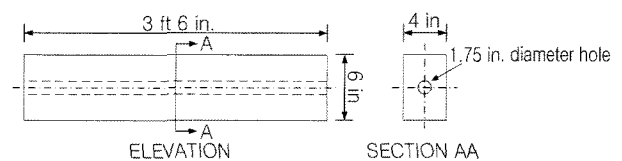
Details of test specimen. (1 in. = 25.4 mm)
